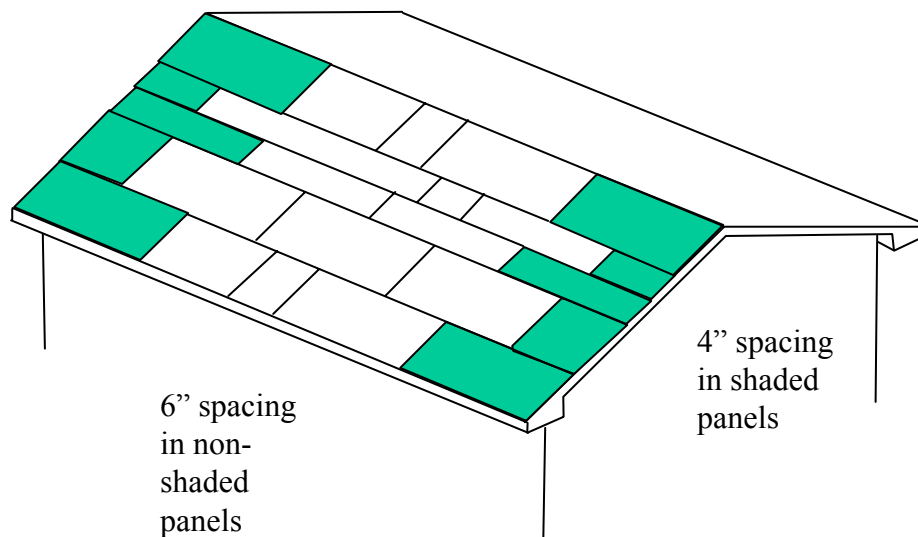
Nail Spacing requirements for plywood or OSB roof deck
